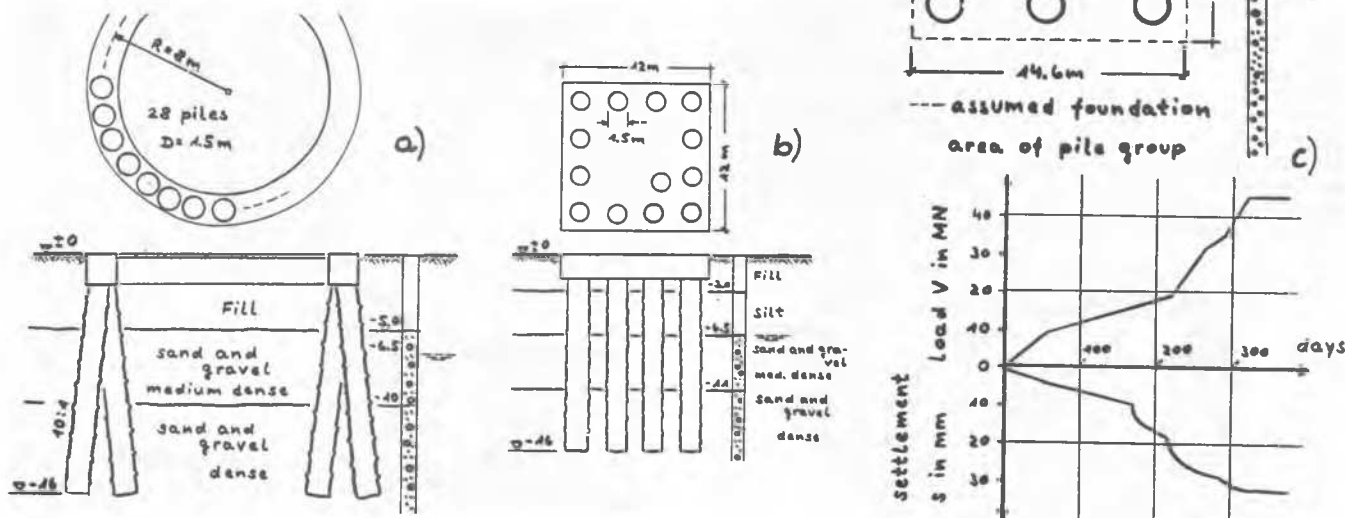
Pile foundations for a) the chimney, b) the stair case tower of a thermal power plant at Mannheim; c) for the pier of a highway bridge at Köln; F.R.G.
